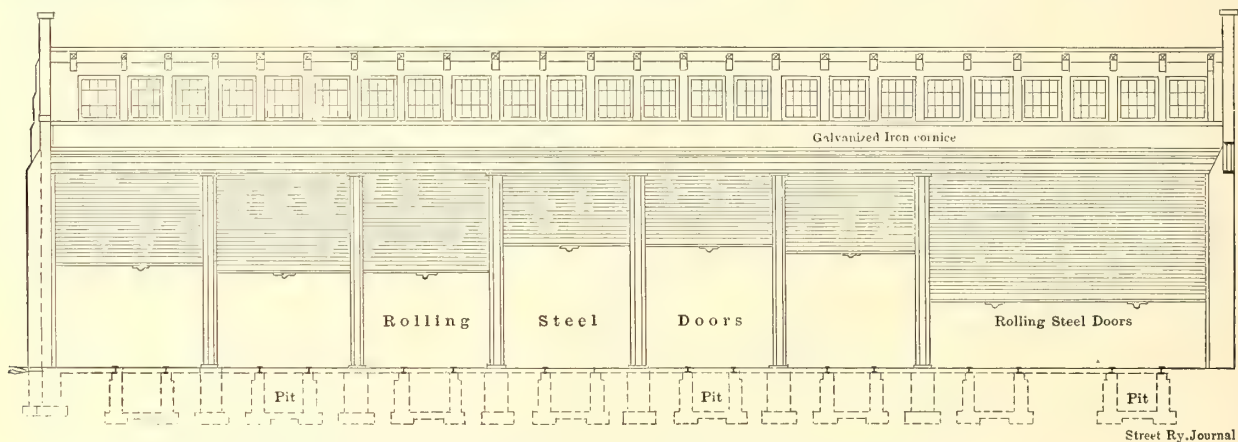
FRONT ELEVATION OF THE INSPECTION BUILDING AT THE OPEN END
